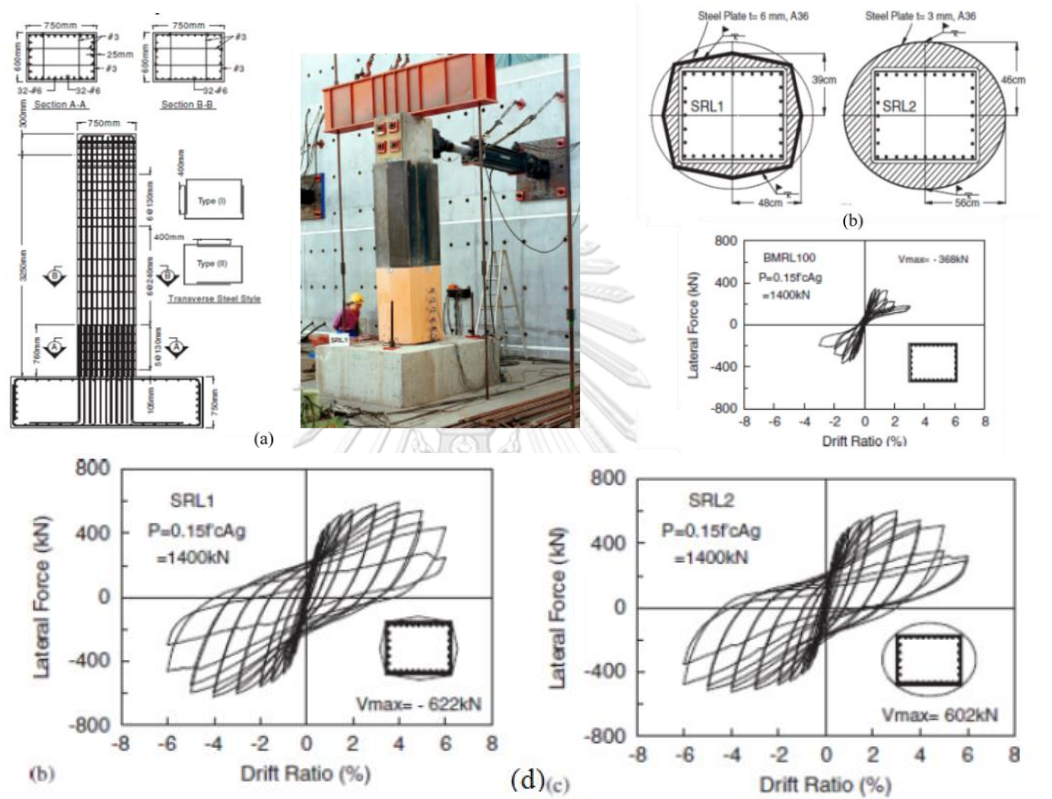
(a) Specimen detail and test set up (b) Jacket details
